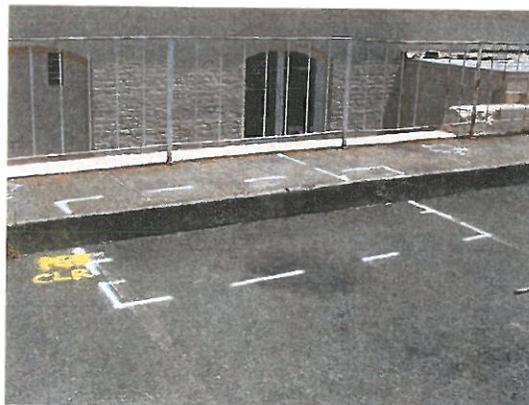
Looking east at Building 47 and UST location, marked in white outline. Photo taken 5/24/2004.
